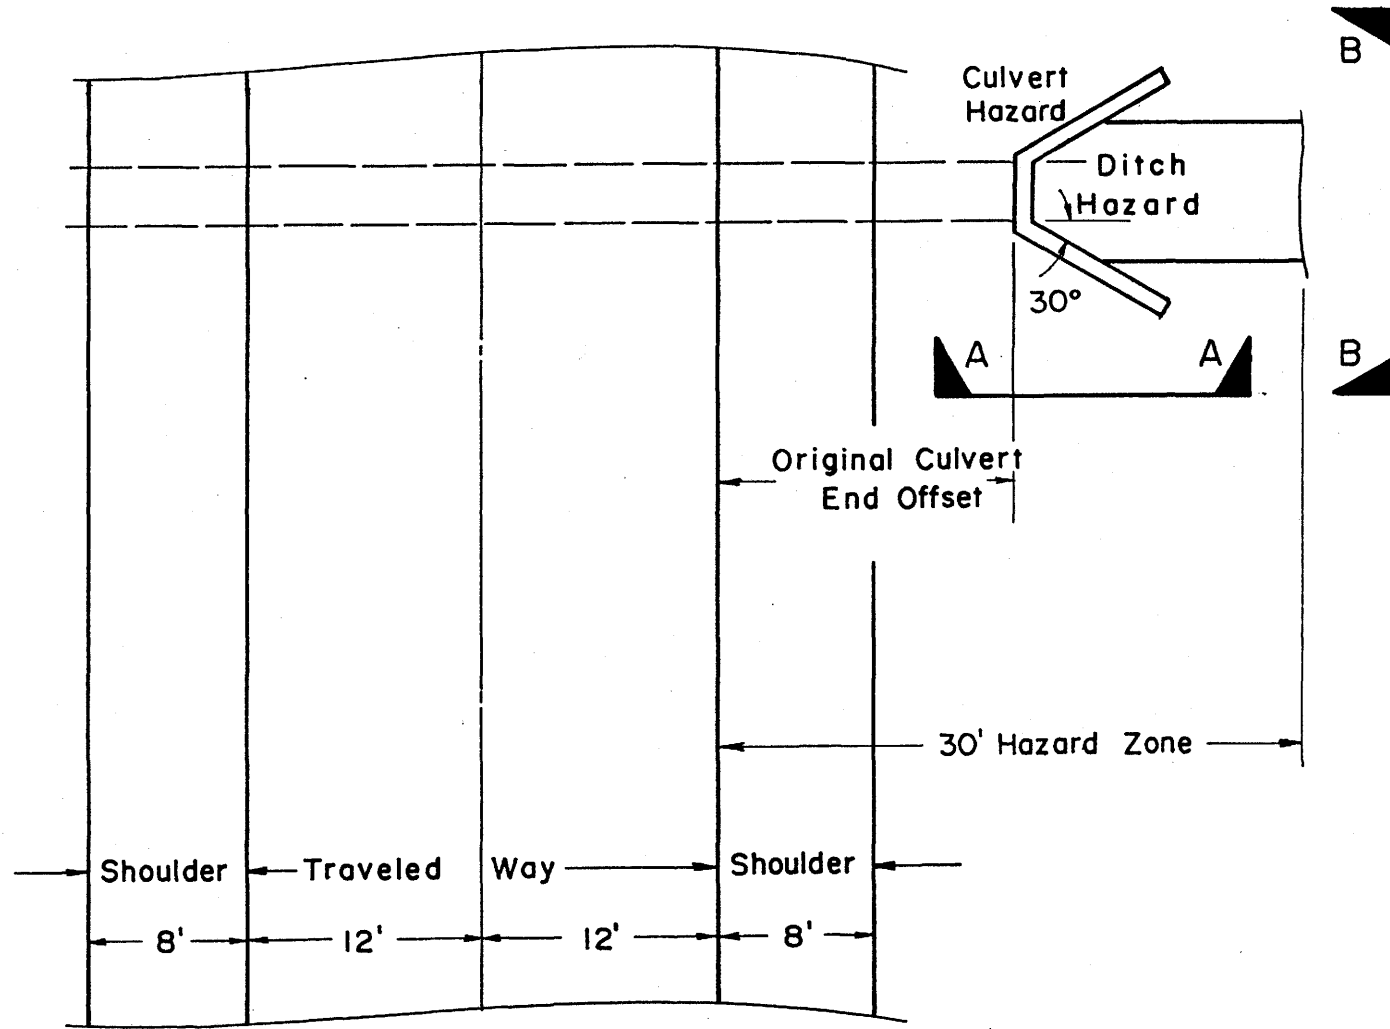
TYPICAL ROADWAY SECTION WITH THE VARIOUS CULVERT DESIGNS
